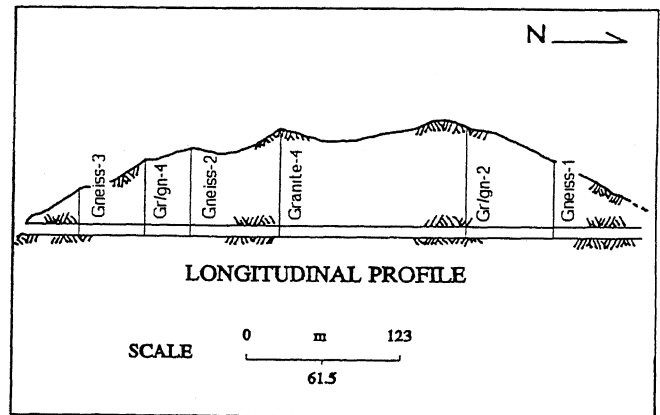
Longitudinal profile of the Platanovrisi Diversion Tunnel
